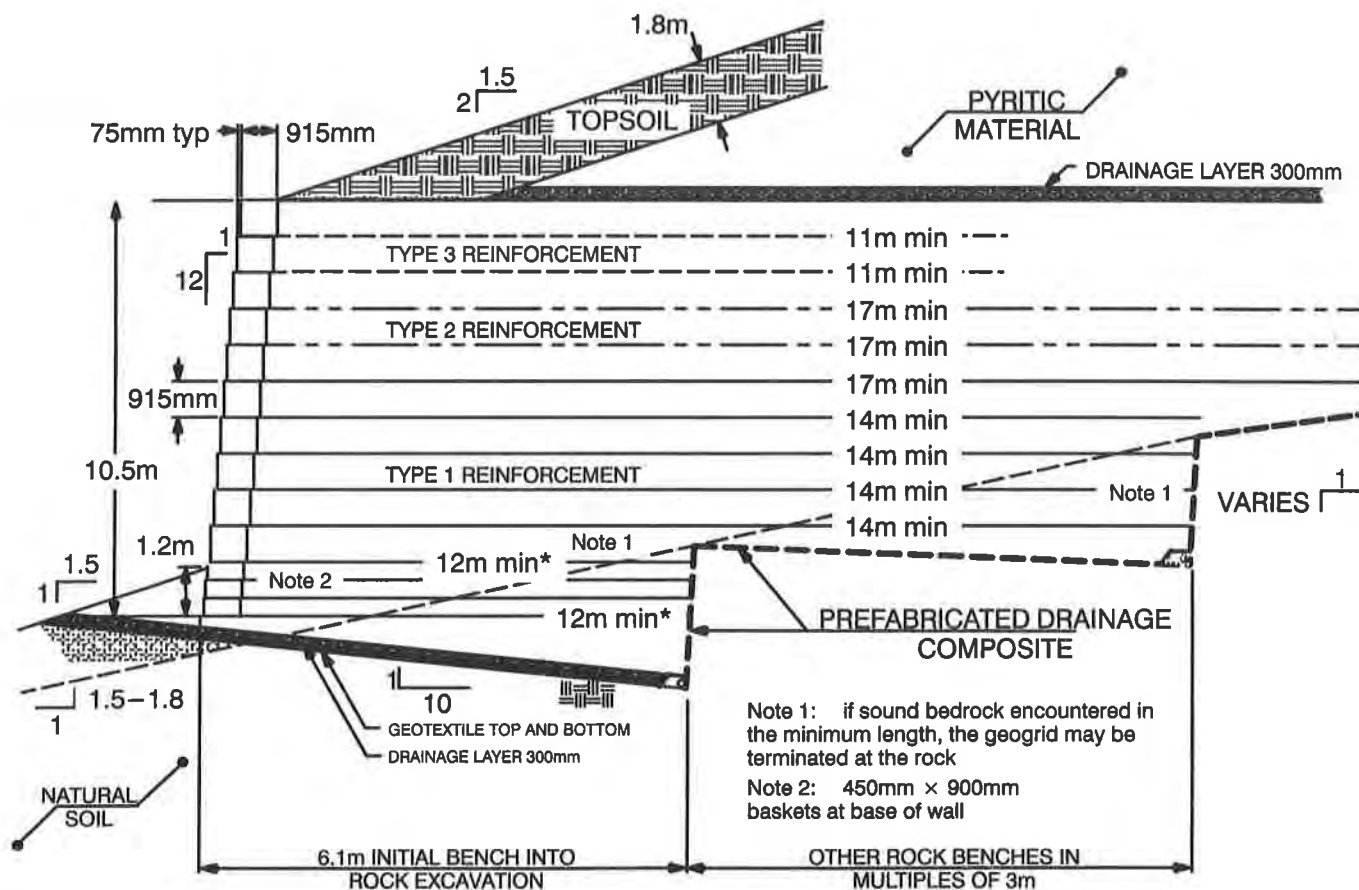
MSE section at maximum height of wall showing design based on (local) wall stability only.
